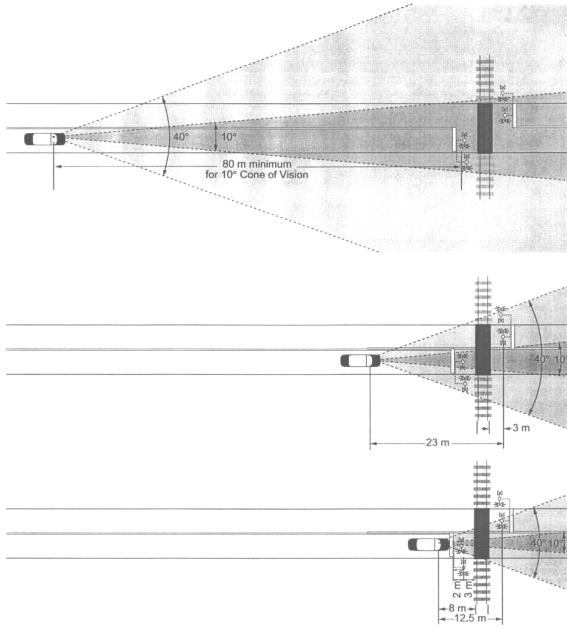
Typical Light Unit Arrangement for an Adjacent Intersection
